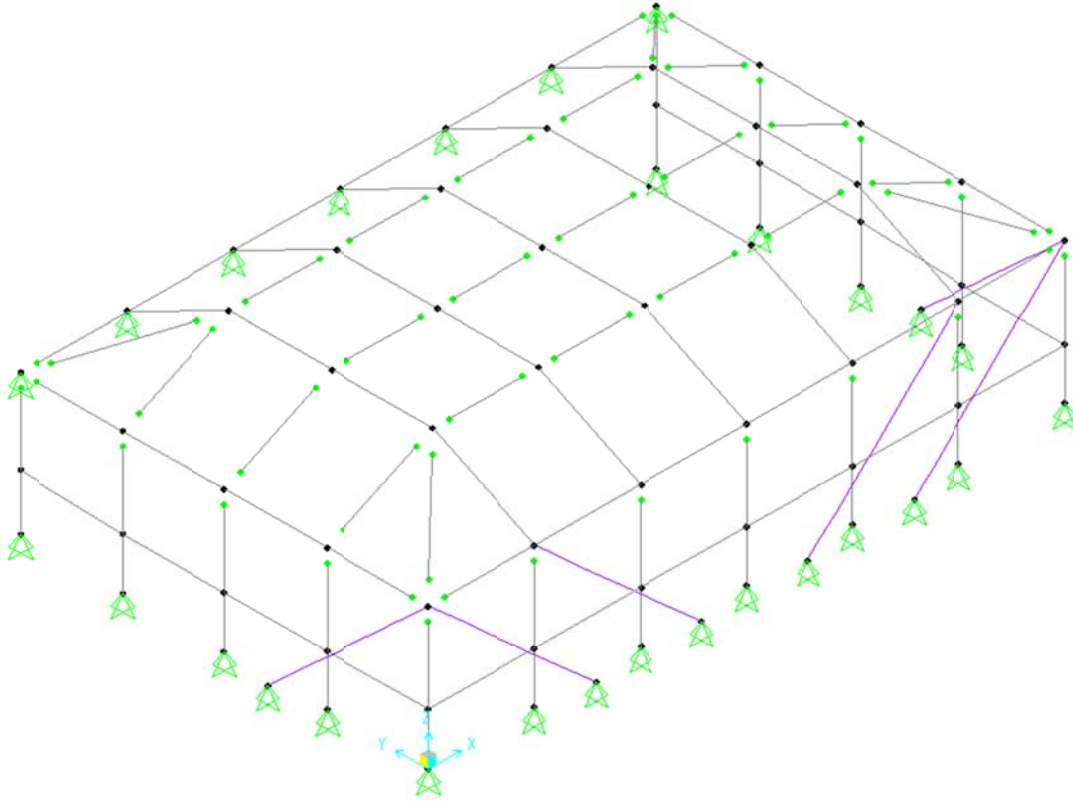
Finite element model of the Generic screen enclosure specimen (AAF specimen does not have side cables, but it has additional roof bracings)
